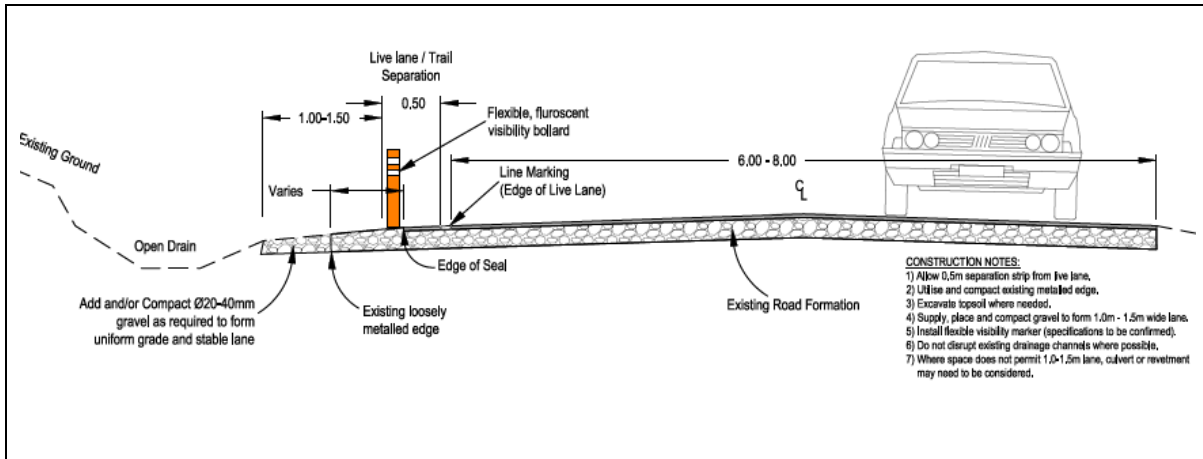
Typical Trail Cross-section 7: Narrow lane adjacent highway
